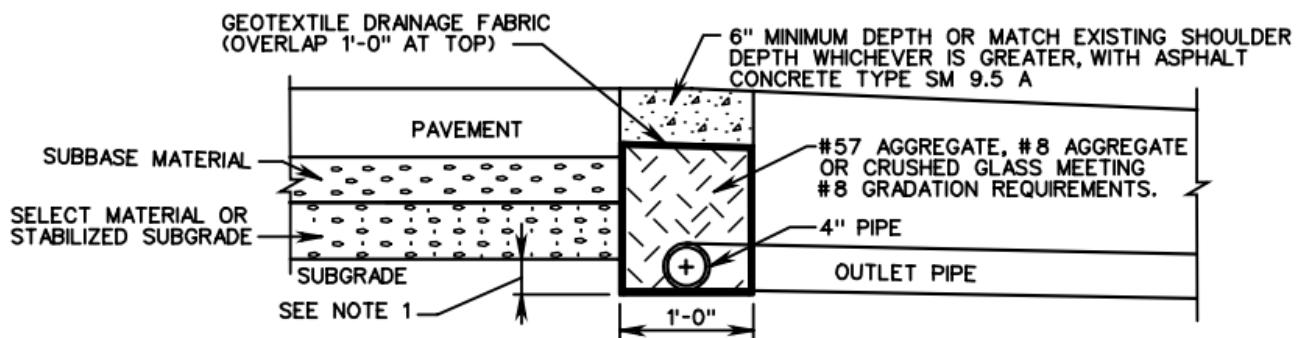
Retrofit Edgedrain Configuration With Drain Pipe on Bottom of Trench (VDOT 2016)
